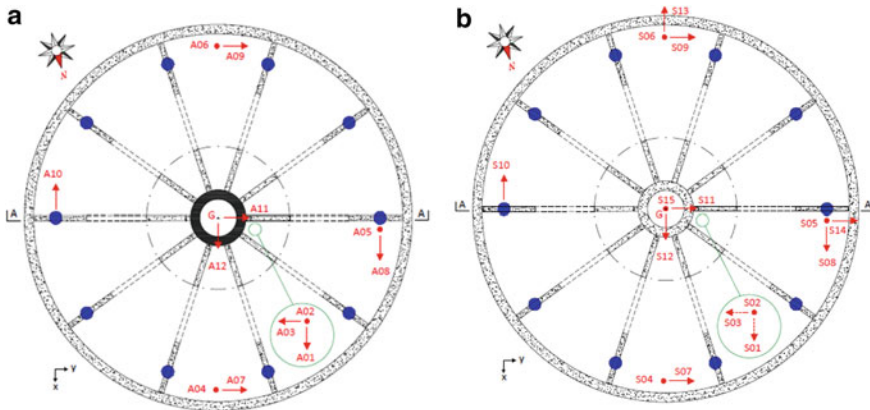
a Plan positioning of accelerometers b Plan positioning of velocimeters
